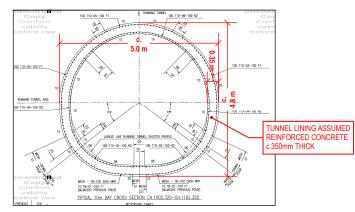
WESTBOUND RUNNING TUNNEL SECTION. EXTRACTS FROM LUL DRAWING 104-B-05-12-601-0
